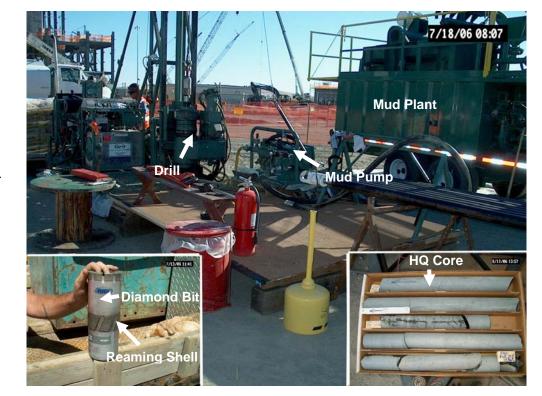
Layout of Core Drill and Accessories; Configuration of Diamond Drill Bit (left inset) and 2.5-in. Core Produced (right inset)
